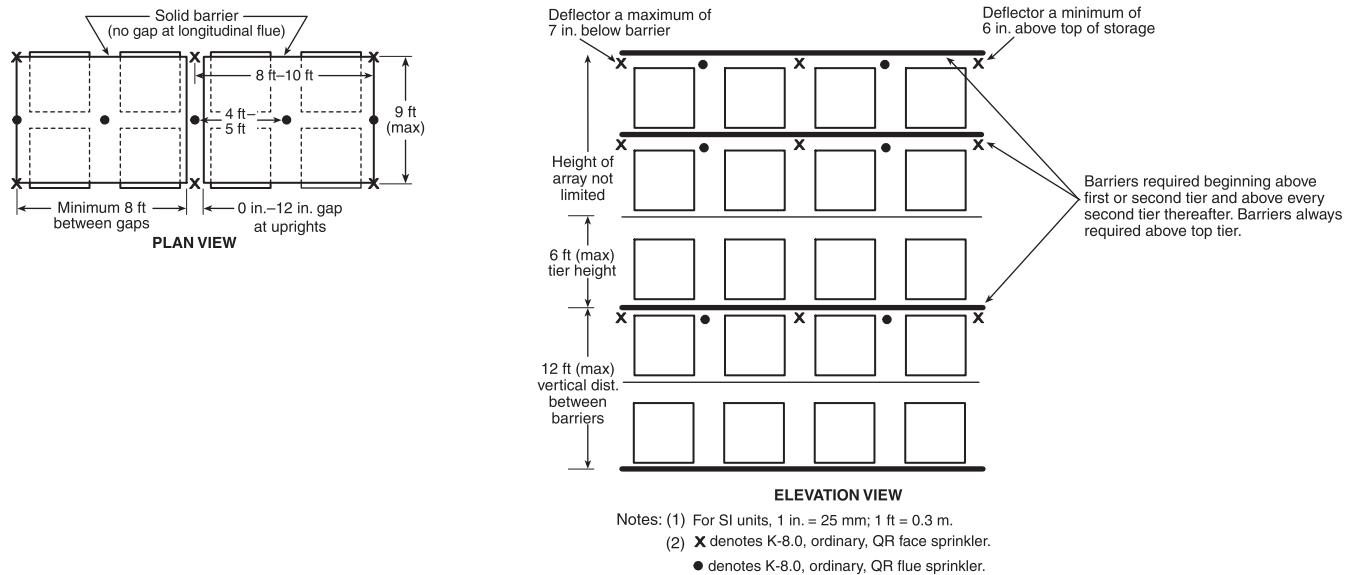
(b) Double-Row Rack Sprinkler Layout for Design Scheme “C.”
